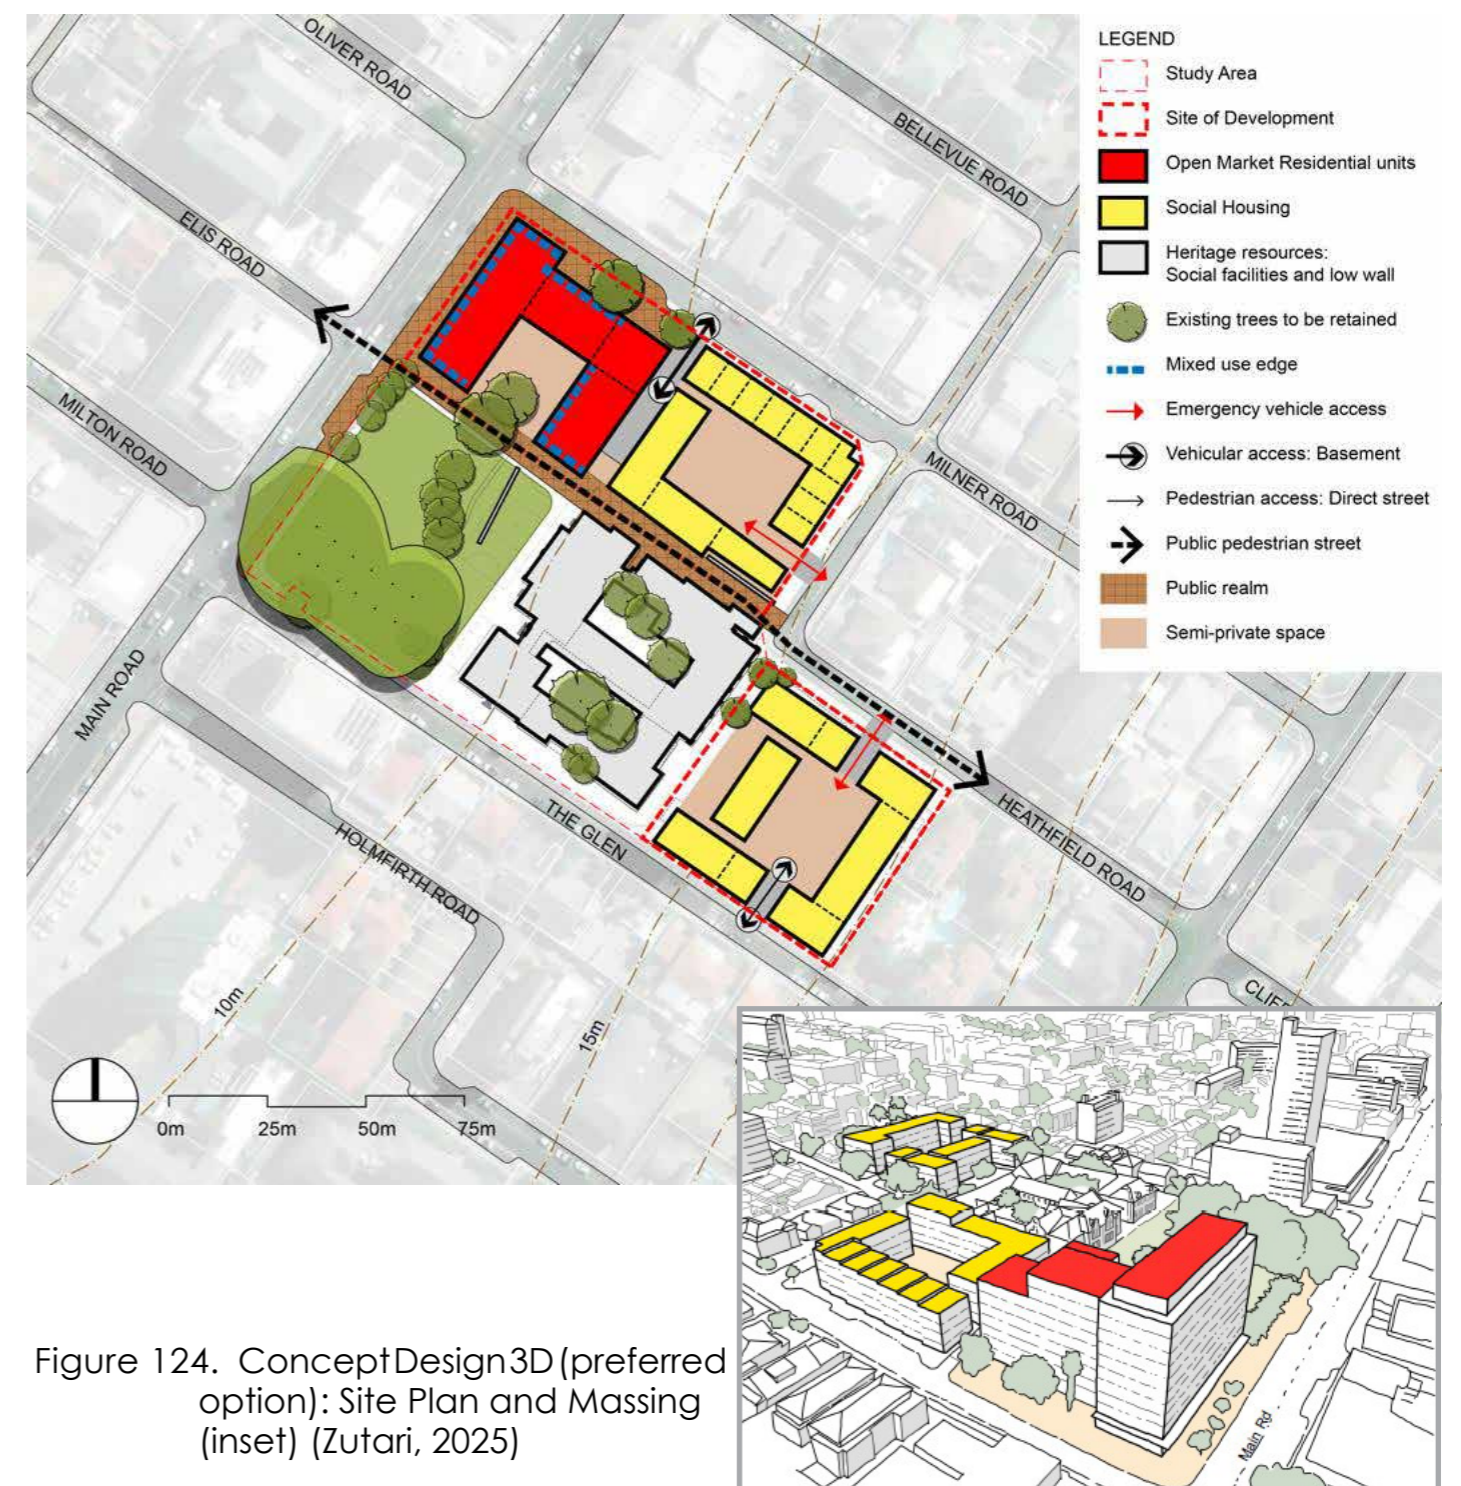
Concept Design 3D (preferred option): Site Plan and Massing (inset) (Zutari, 2025)
